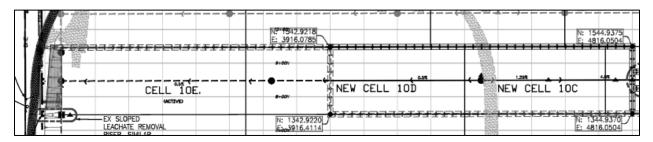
Engineering site plan top view of North Slope (City of Enid)
